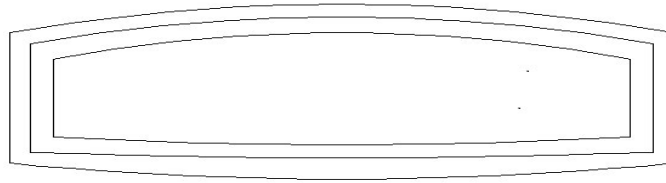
Underground crossing street, Chang'an Street, Beijing
